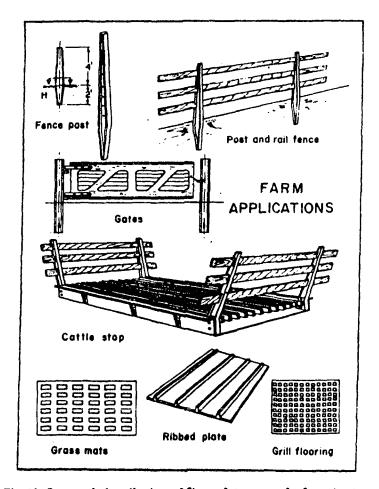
Some typical applications of fibrous ferrocement for farm structures.
